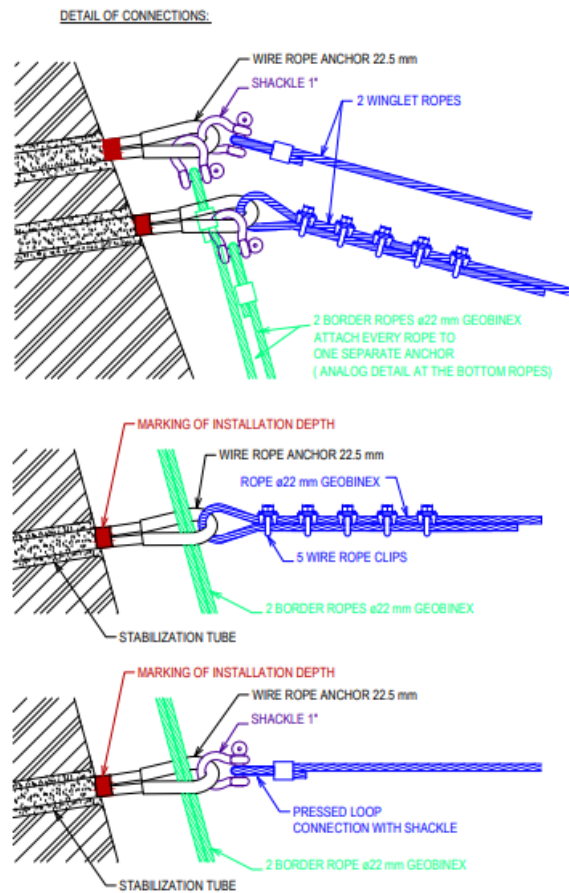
Design of grouted rock anchor supported slash trap (2)
